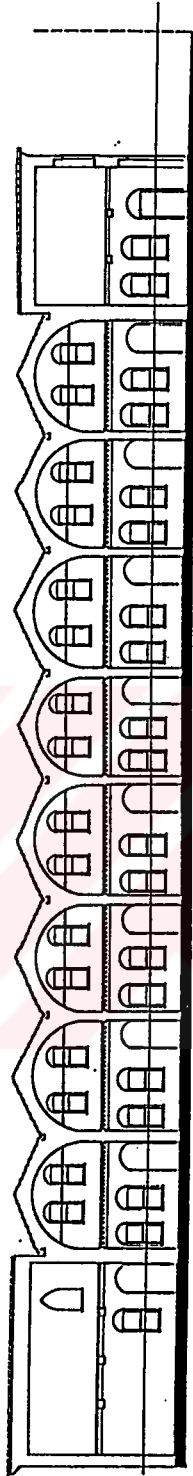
North East Wing, South West Wall. Interior (Restitution)
